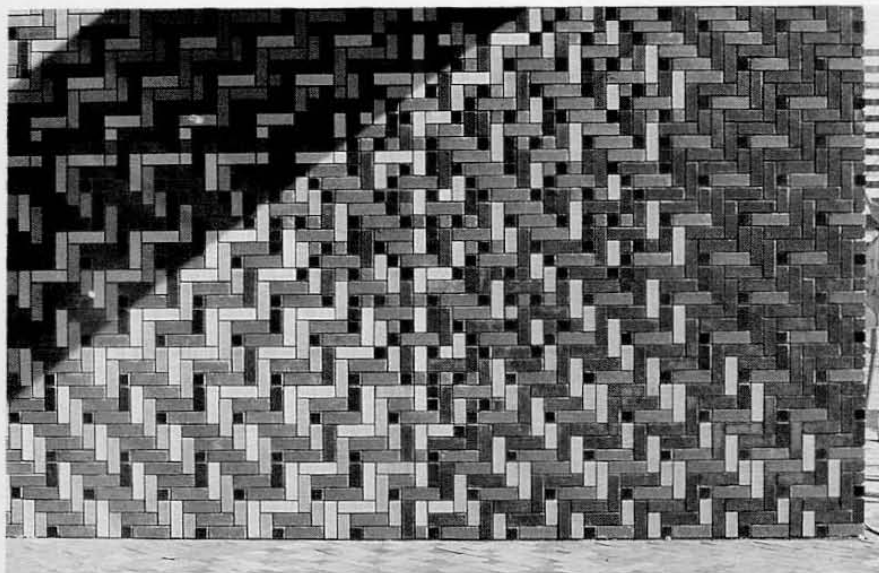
Entrance to an office and retail building in Bethesda, MA, U.S.A.
